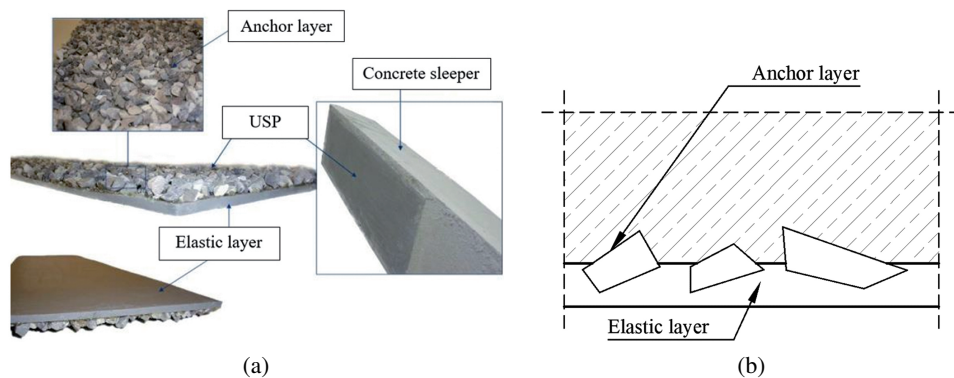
USPs used on French railways: (a) details of the anchor and elastic layers of the pad [22, 24]; (b) anchoring scheme
